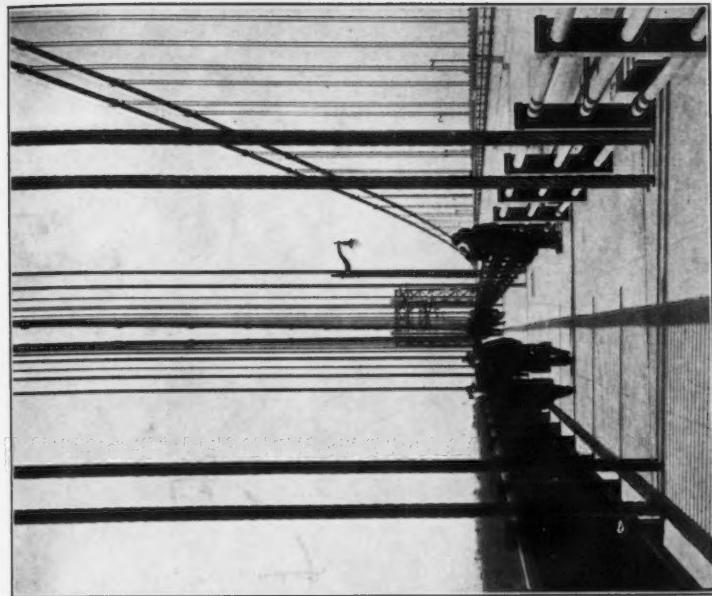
VIEW ALONG SIDEWALK, GEORGE WASHINGTON BRIDGE.
